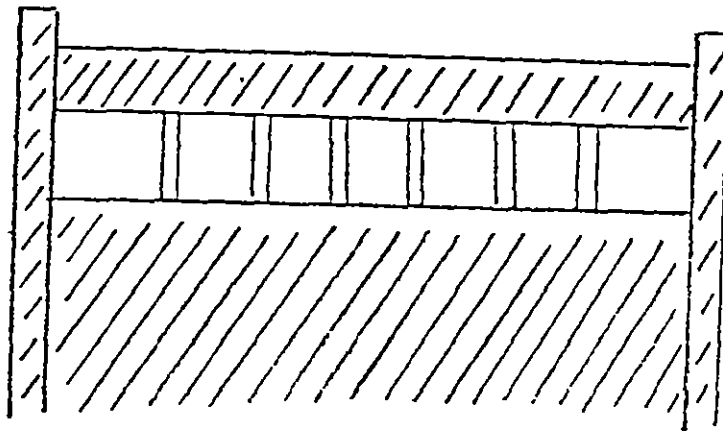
FIGURE A CRIB END PANEL WITH FULLY BOUNDED OPENINGS
